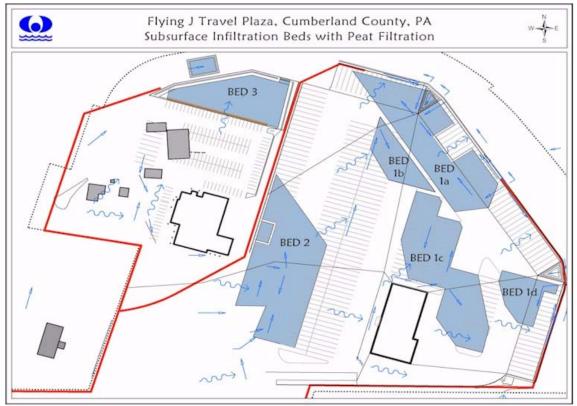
Stormwater flow path for the Travel Plaza stormwater management system.
